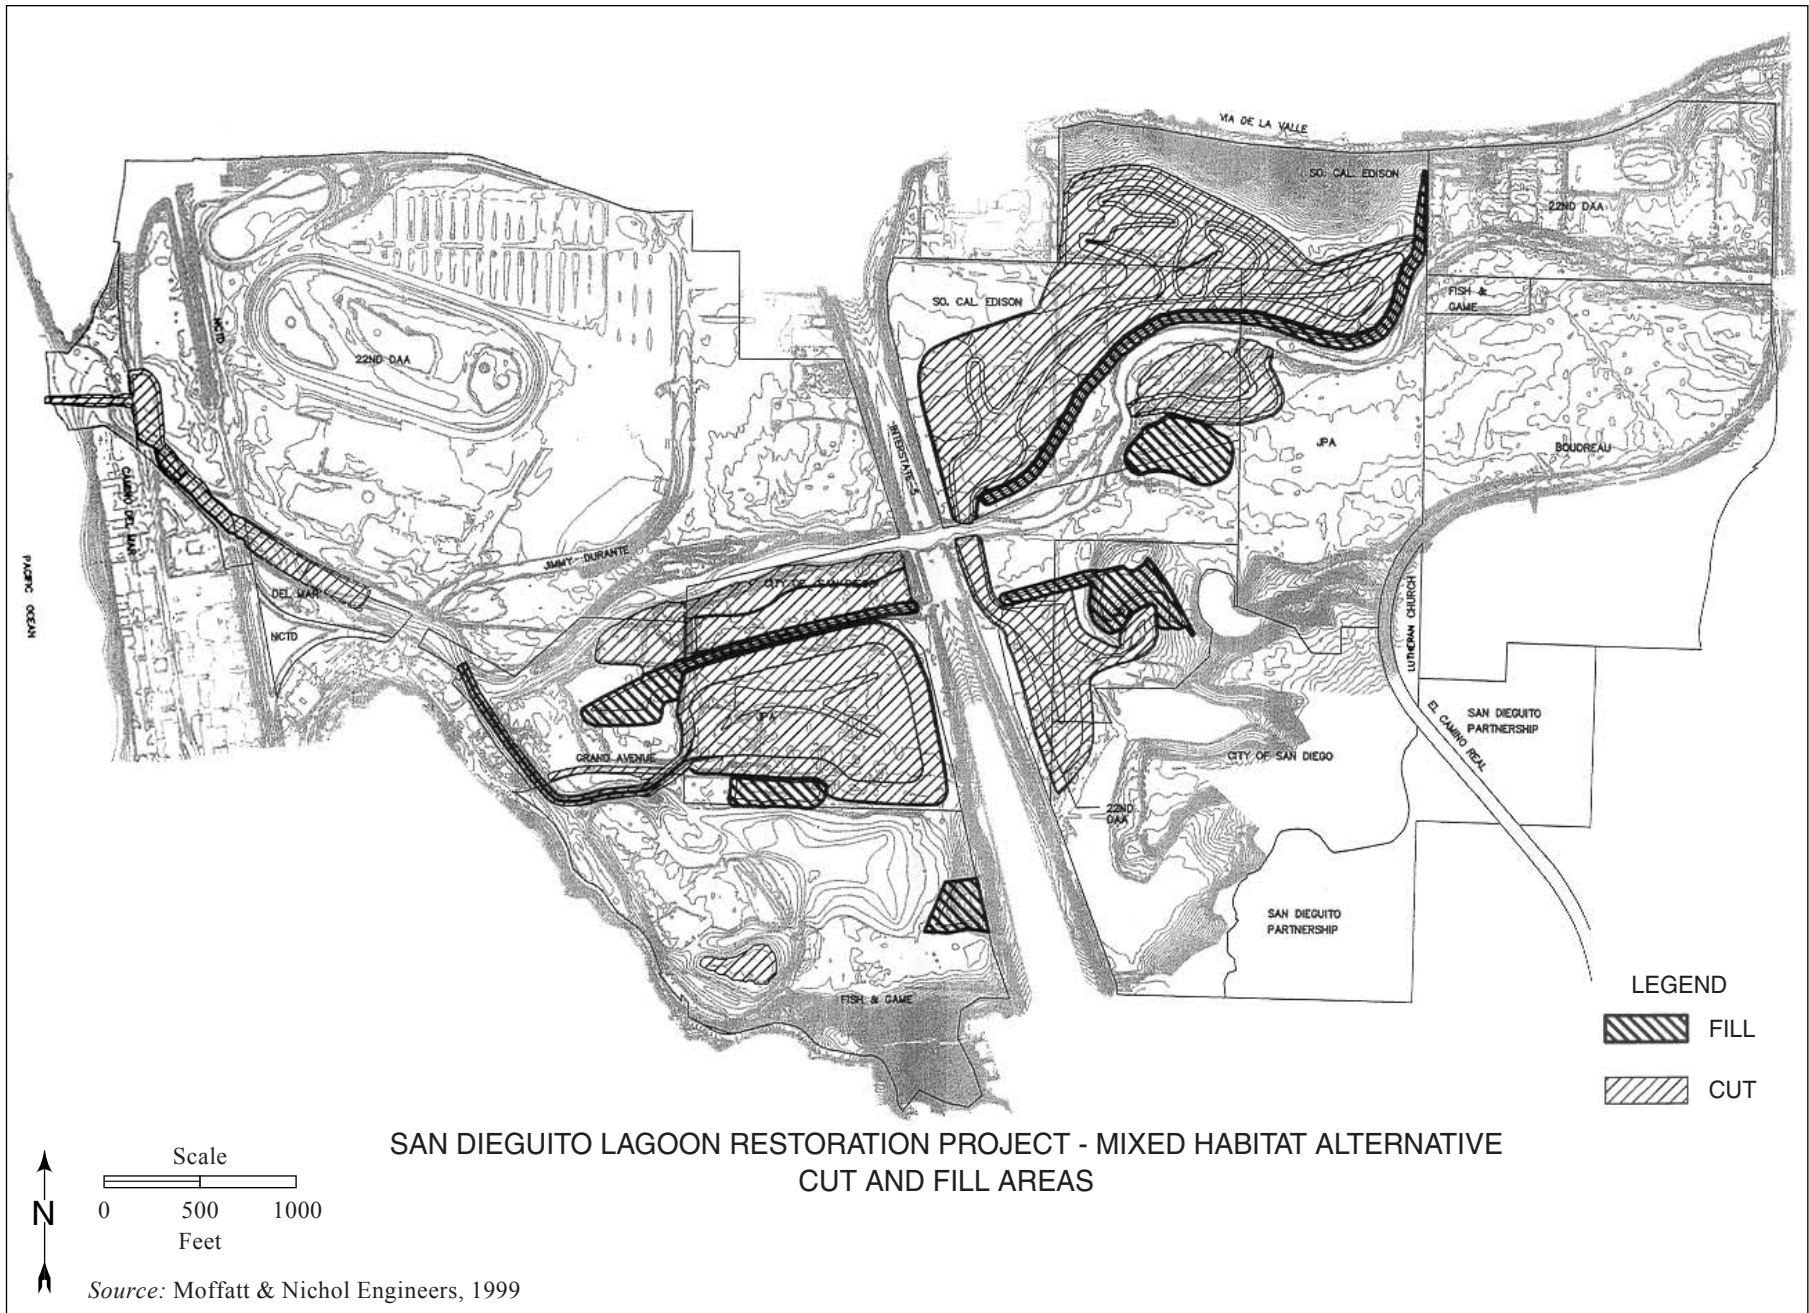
Mixed Habitat Alternative - Cut and Fill Areas
